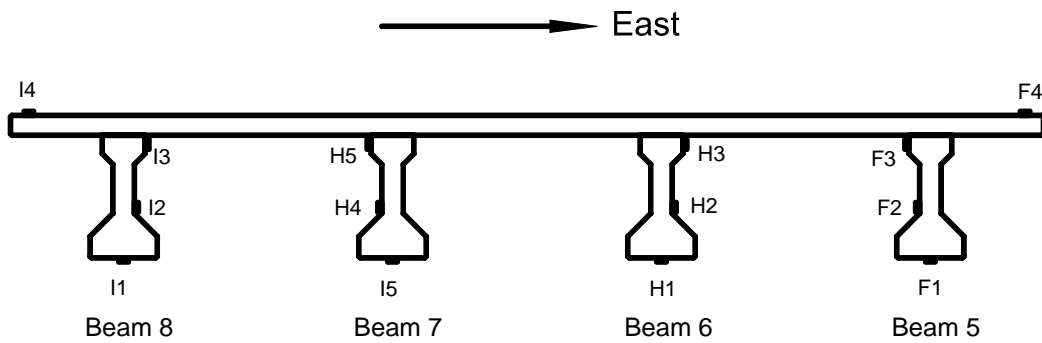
Strain Gage Locations – Chandler Creek Bridge – 60’ Span
